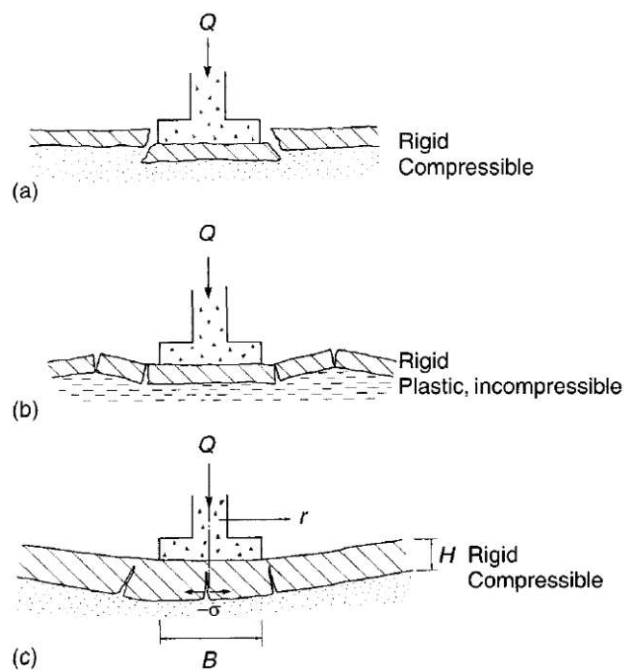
Spread footings on layered rock formations (a) punching failure, (b) buckling failure, and (c) bending failure. [25]
